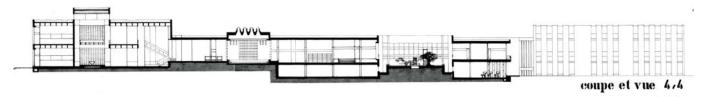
Altuğ, Behruz Çinici, Publication Drawings, Section, 1962
